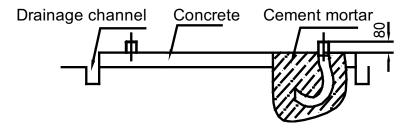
Outdoor unit typical concrete base structure design (unit: mm)
